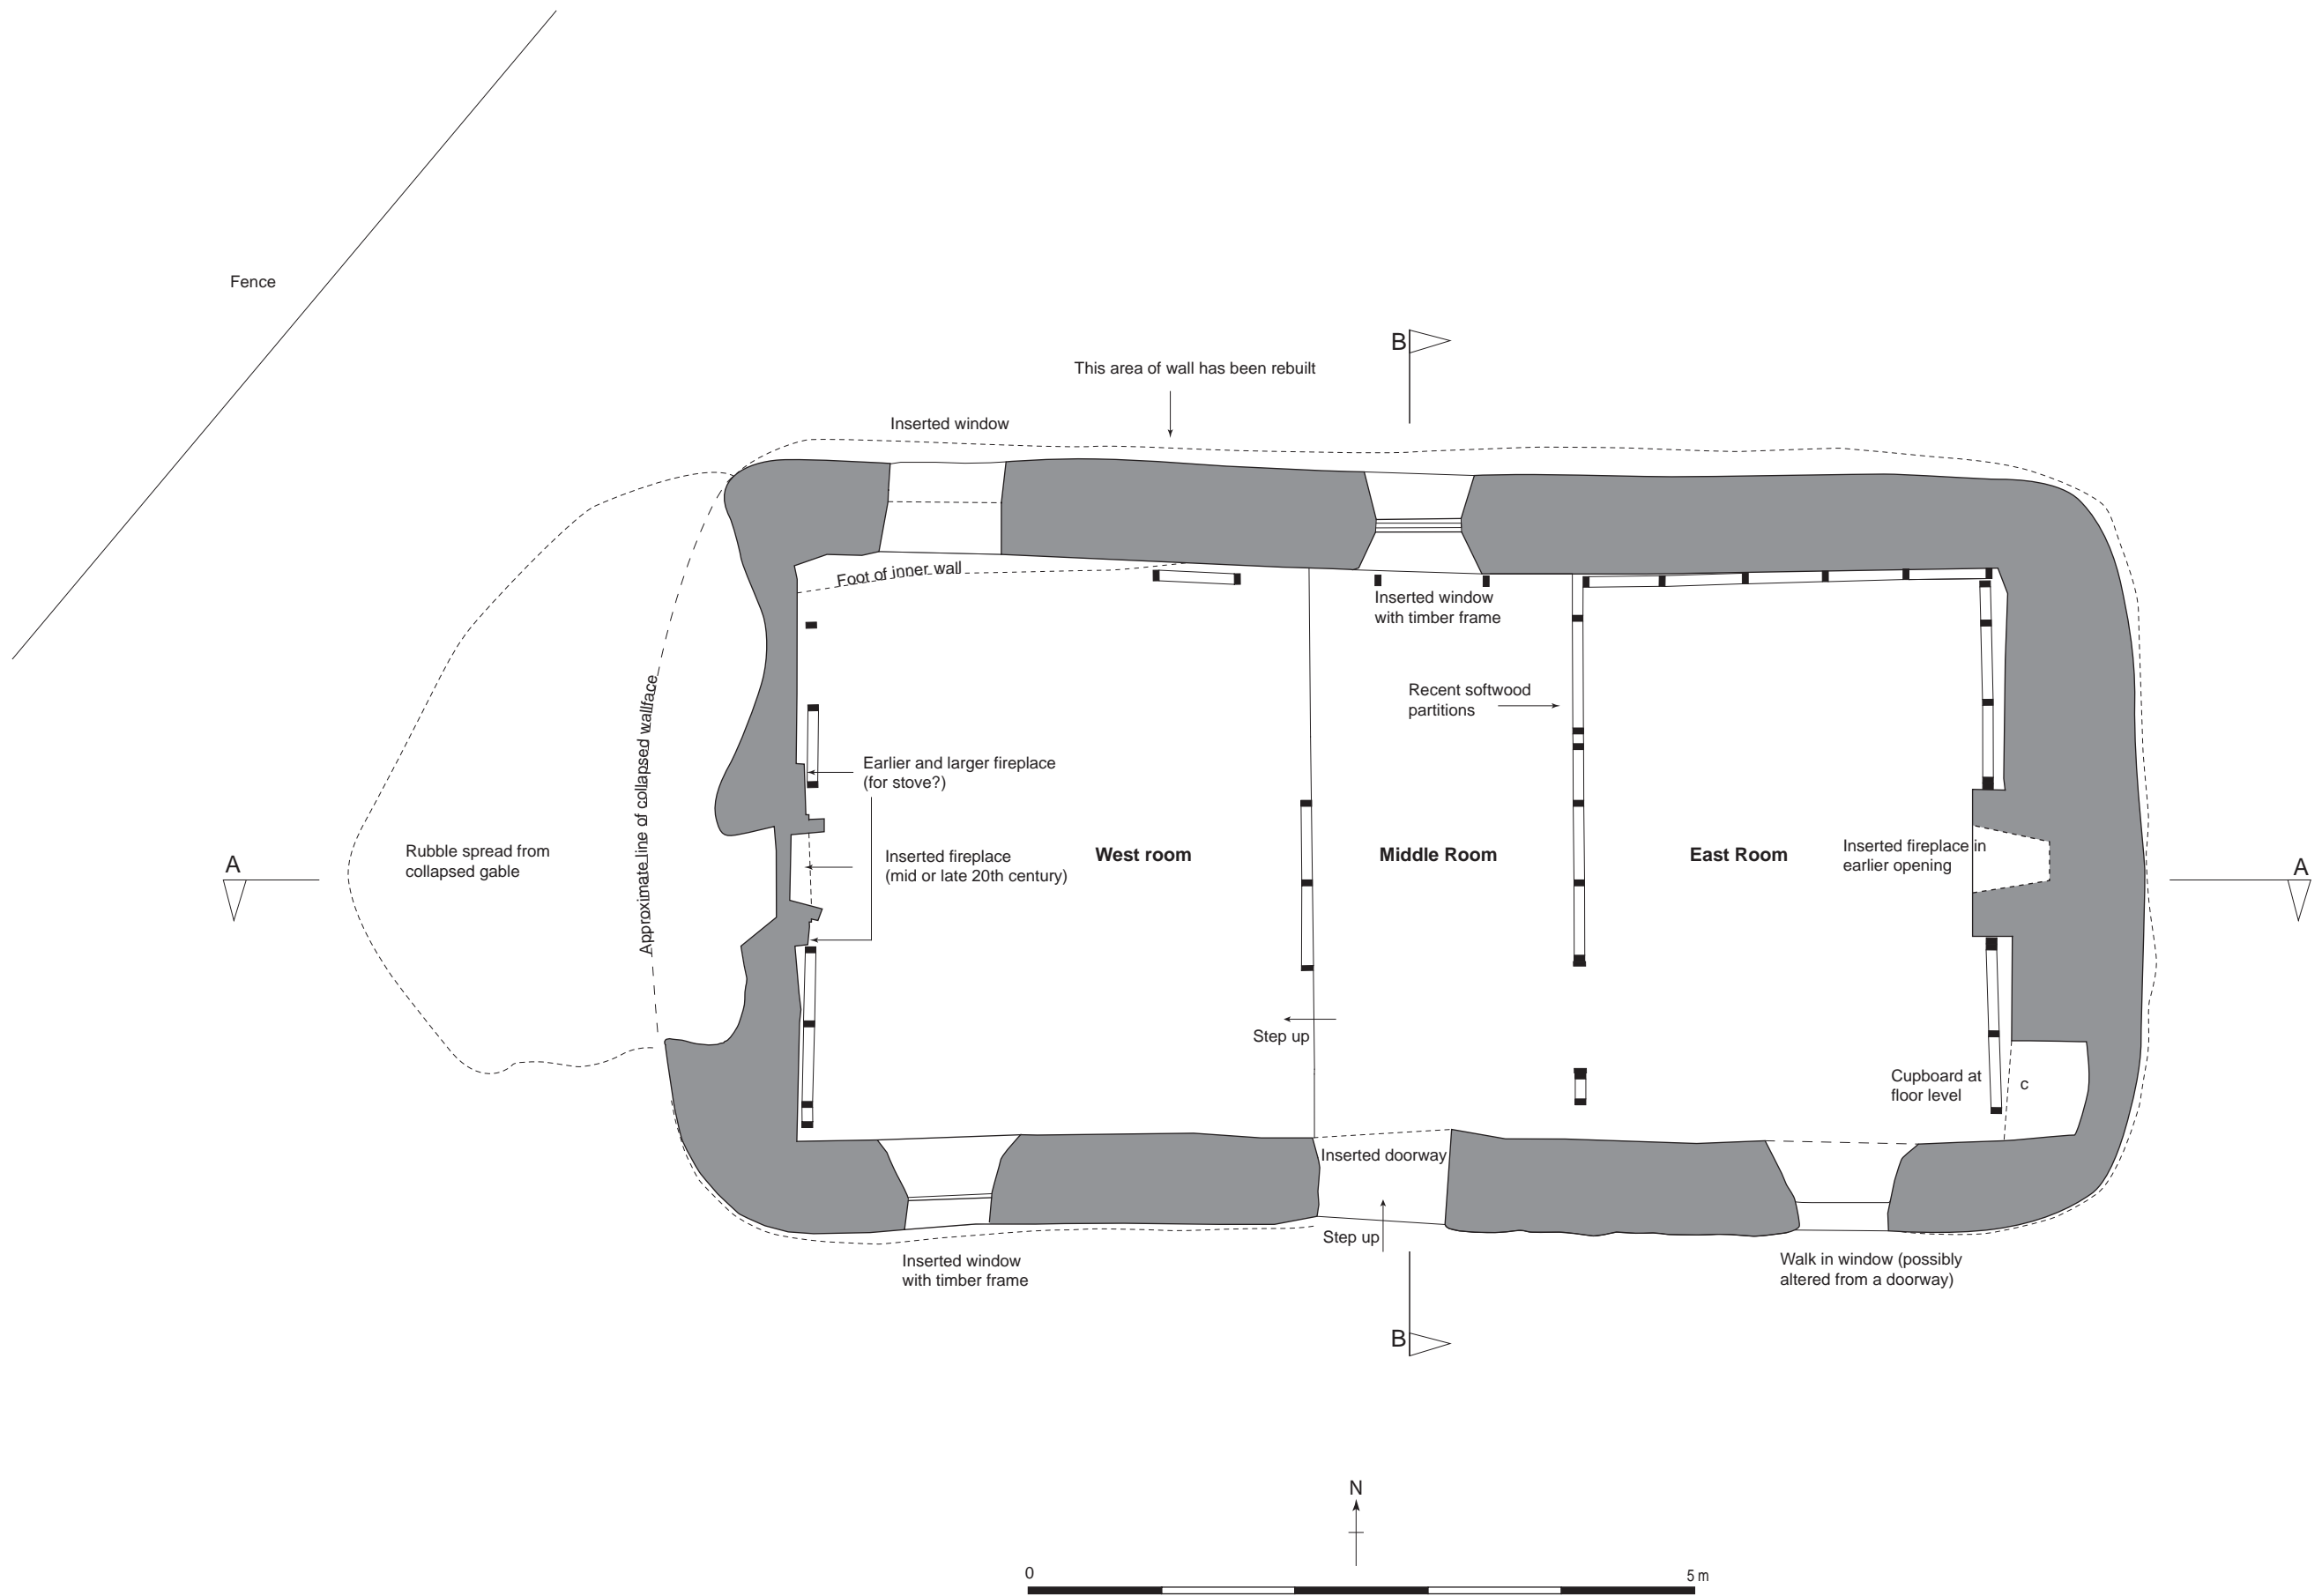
BCB06: Braigh Cottage ground-floor plan (1:50 @A3)
